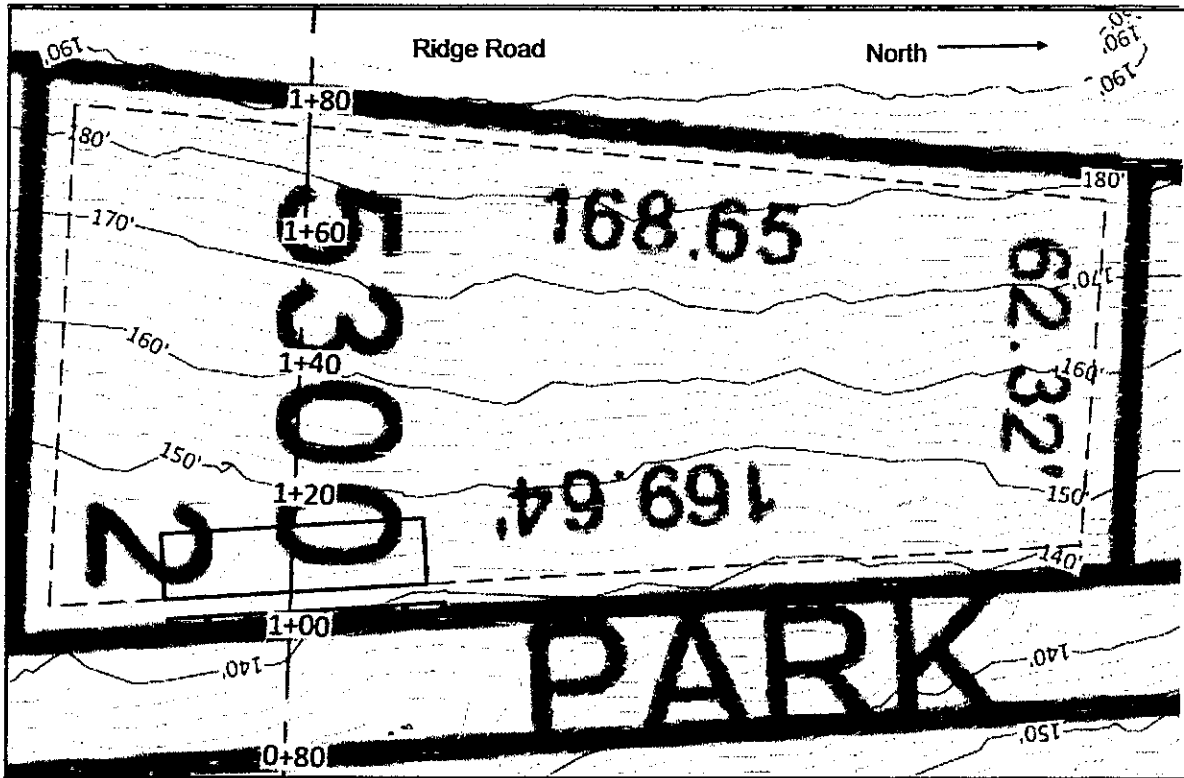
2008 Lidar topography of Tax Lot 5300 showing proposed 10-foot by 40-foot home footprint set back 5 feet from Park Lane right-of-way, prepared by Morgan Civil Engineering, Inc.
